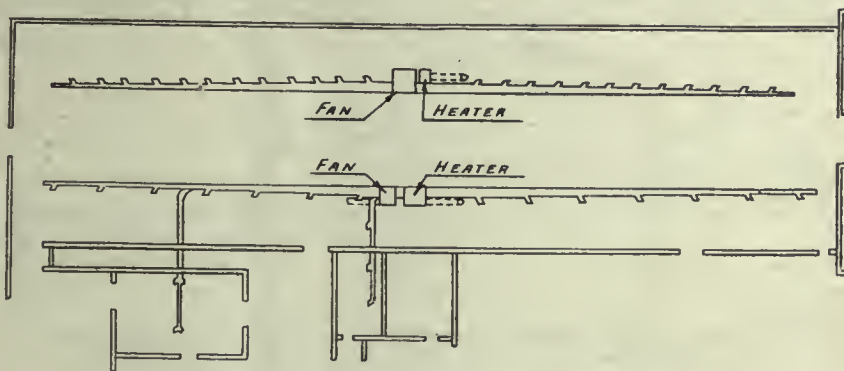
PLAN LAYOUT OF FOUNDRY HEATING SYSTEM.
